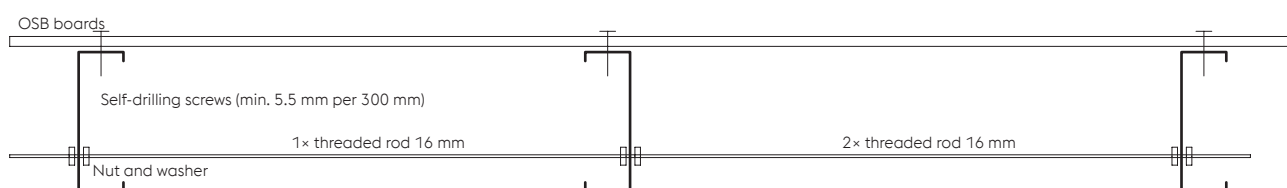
Arrangement of stabilising bars in case of an odd number of floor beams in a lightweight floor construction
